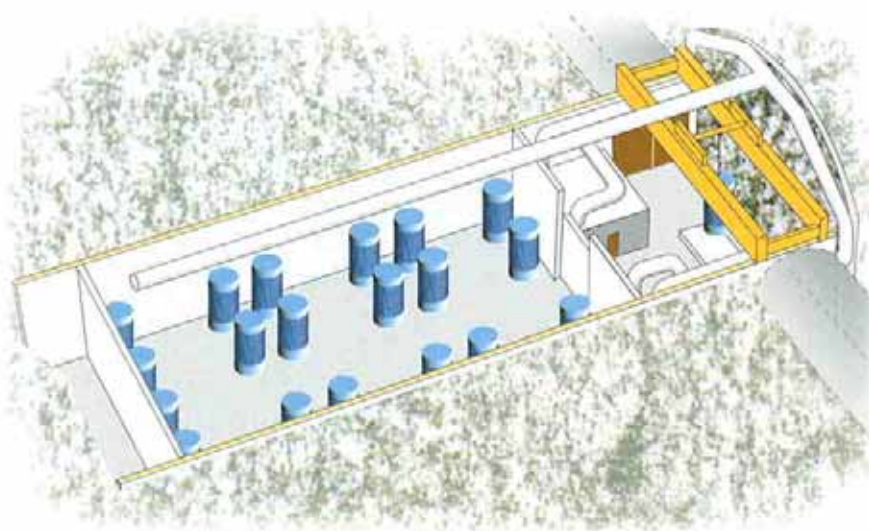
Example of an interim storage alternative based on dry storage facilities excavated in the rock.
